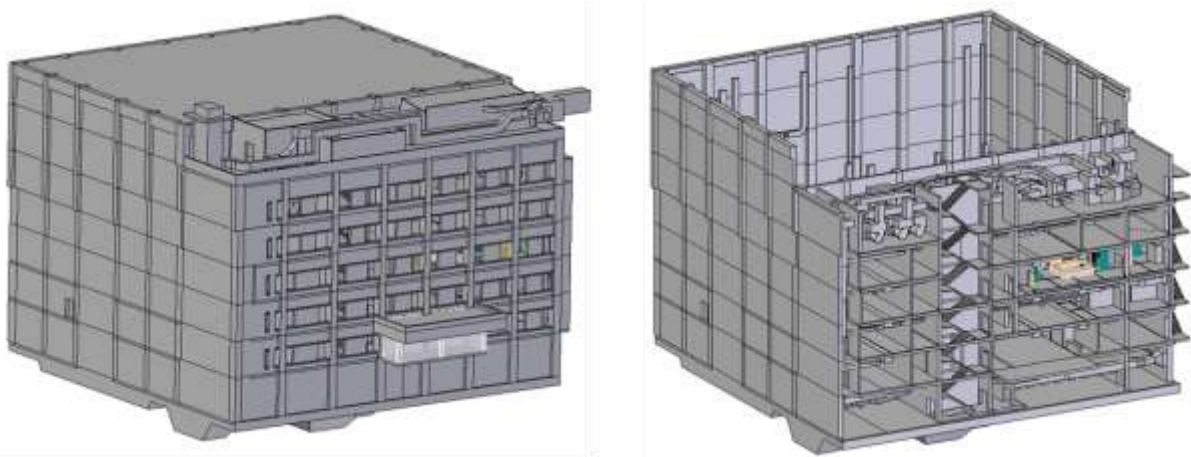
Shape of Reactor building (left: exterior, right: without roof trusses)
